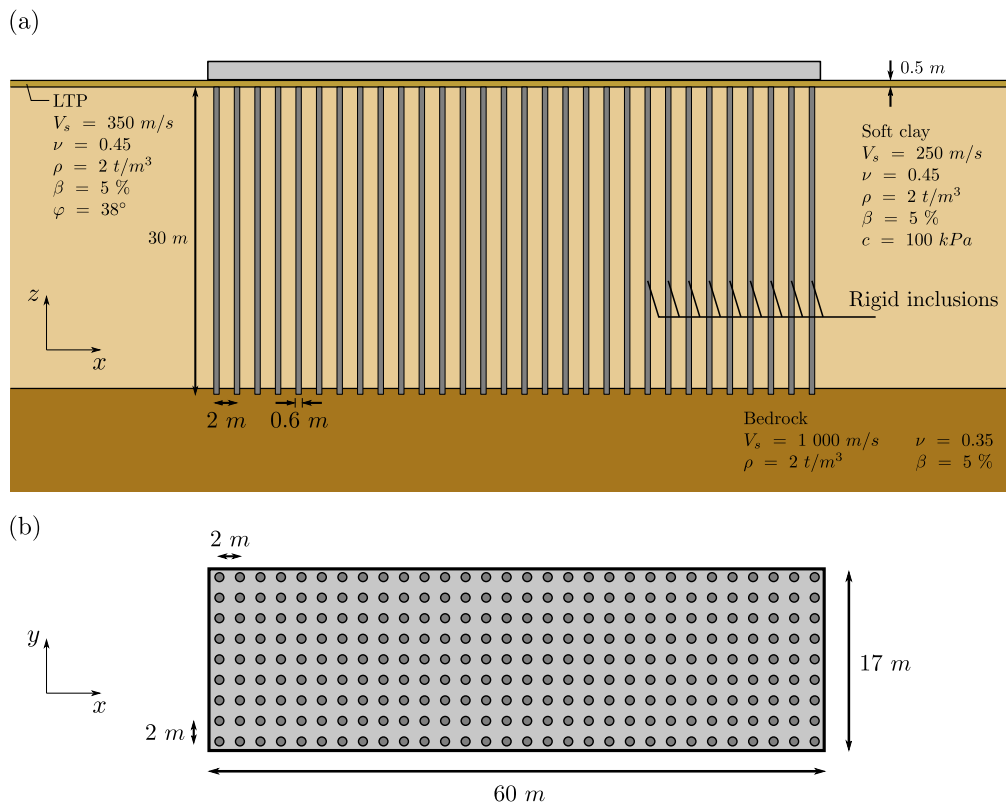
General layout of foundation system: (a) cross-section view and (b) plan view of the foundation and the soil profile
